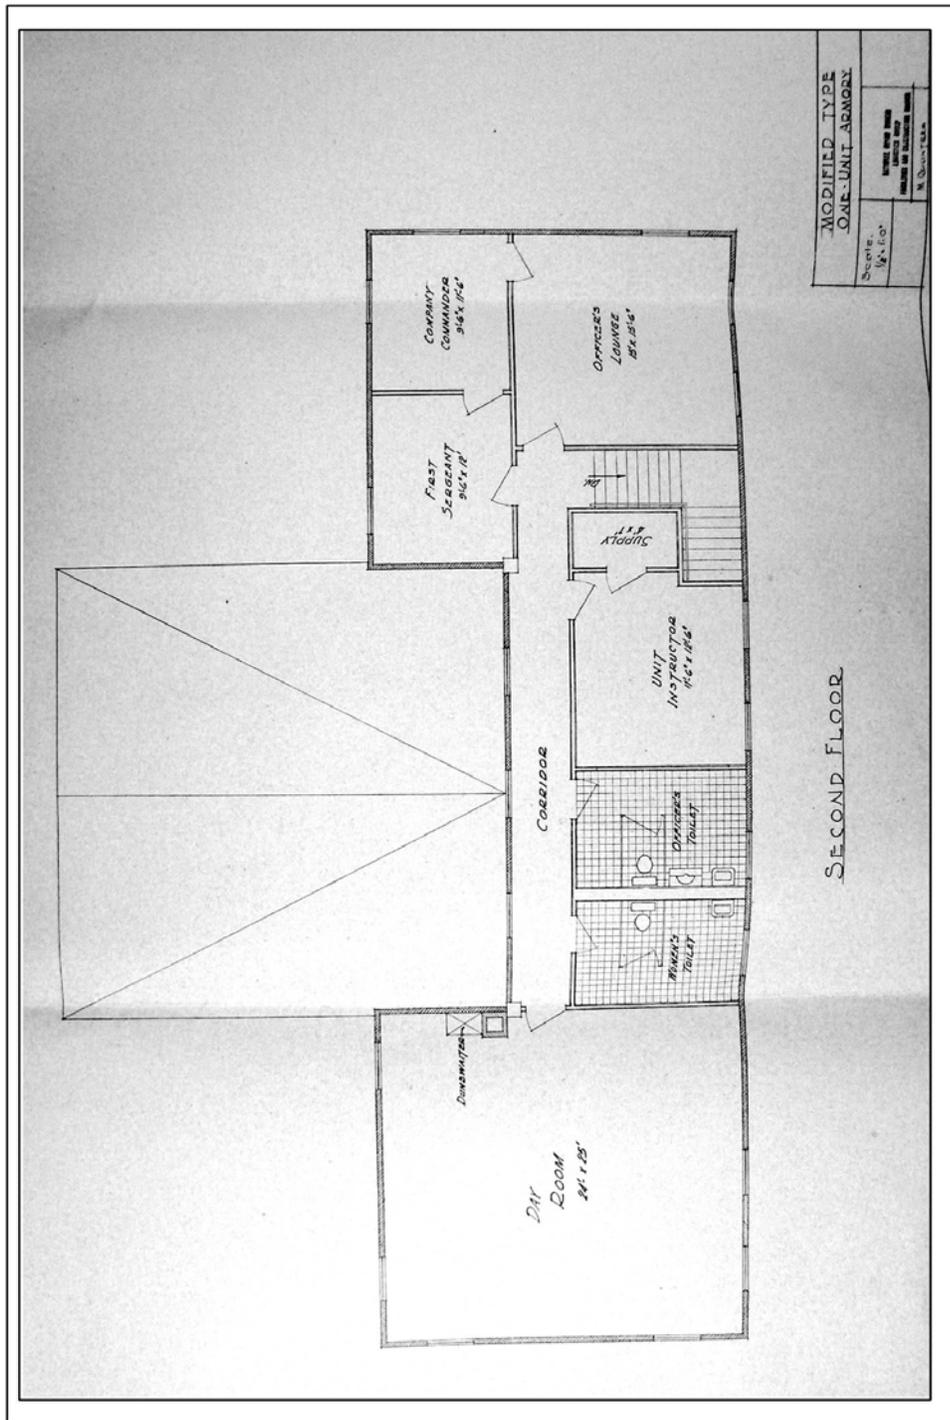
Standard Plan for an Armory developed by the National Guard with the Army Corps of Engineers, 1948 (courtesy of the National Archives II, College Park, MD, Army-National Guard Bureau Decimal File, 1946-1948, RG 68).
